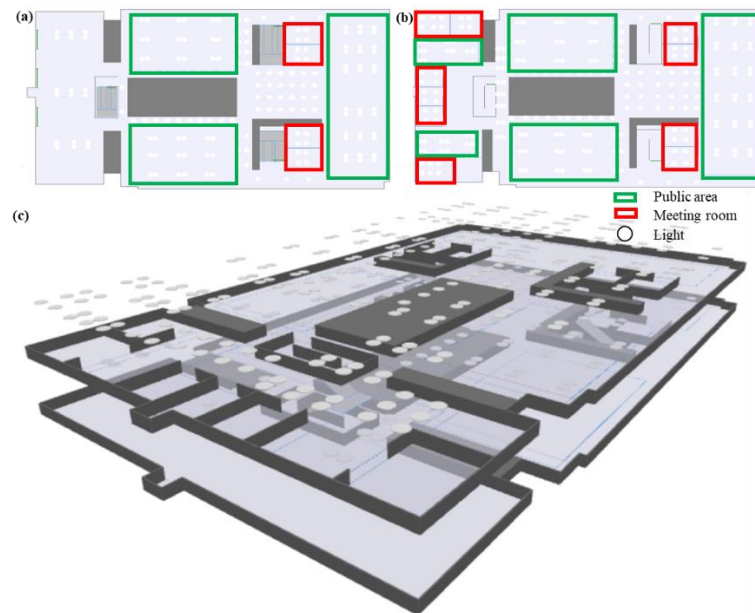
The Floor plan of Alan Gilbert learning commons (a) 2D Ground floor; (b) 2D First Floor; and (c) 3D view of the building.
